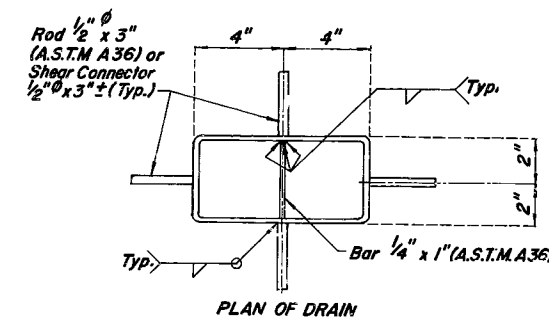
DETAILS OF DRAINS TRANSVERSE TO ROADWAY
